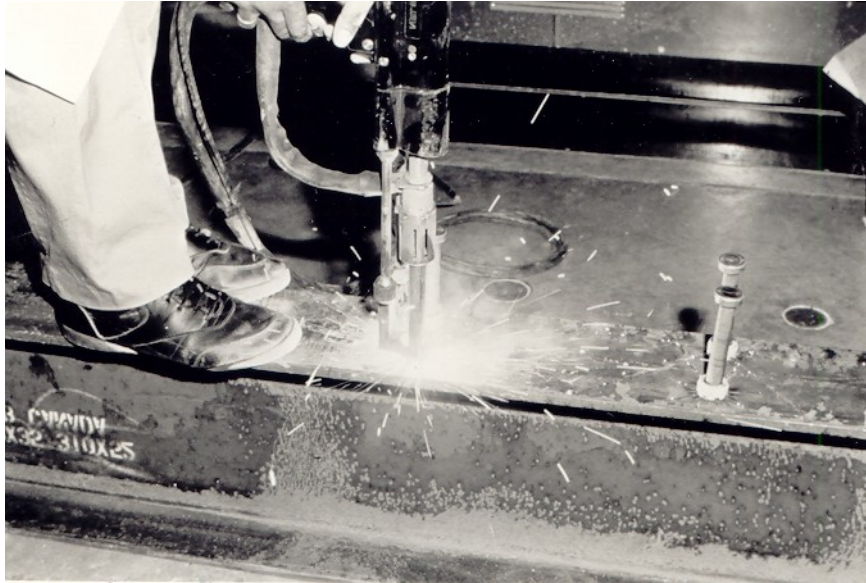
Welding of stud shear connector using a welding gun.
